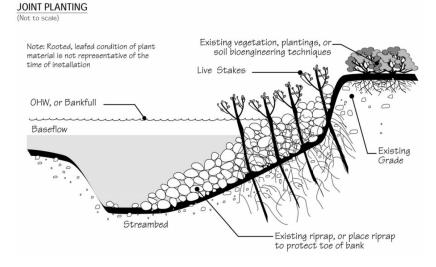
Cross section of embankment showing joint planting technique consisting of live planting interspersed with rip rap. USEPA 2007.
